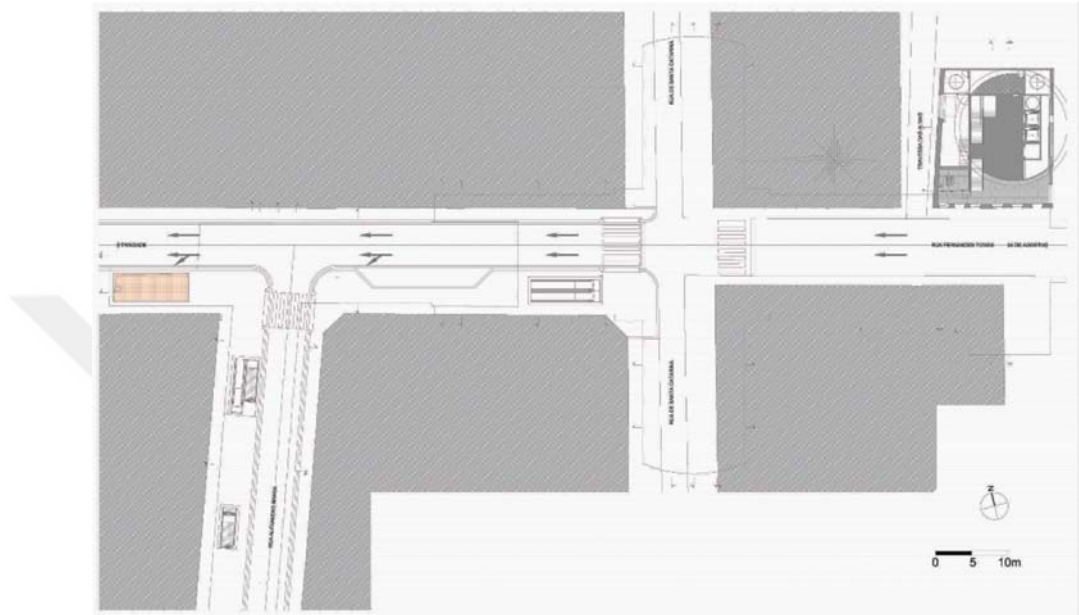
Bolhao Station Surface level site plan. Station building is located at the top right and two entrances at the left bottom corner of the drawing (Eduardo Souto de Moura)
